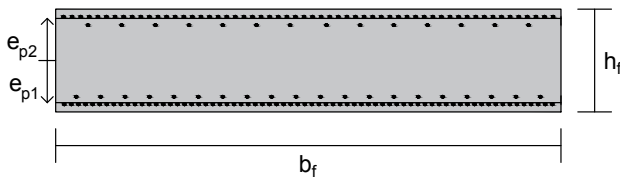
Prestress configuration in the massive floor element in x-direction
